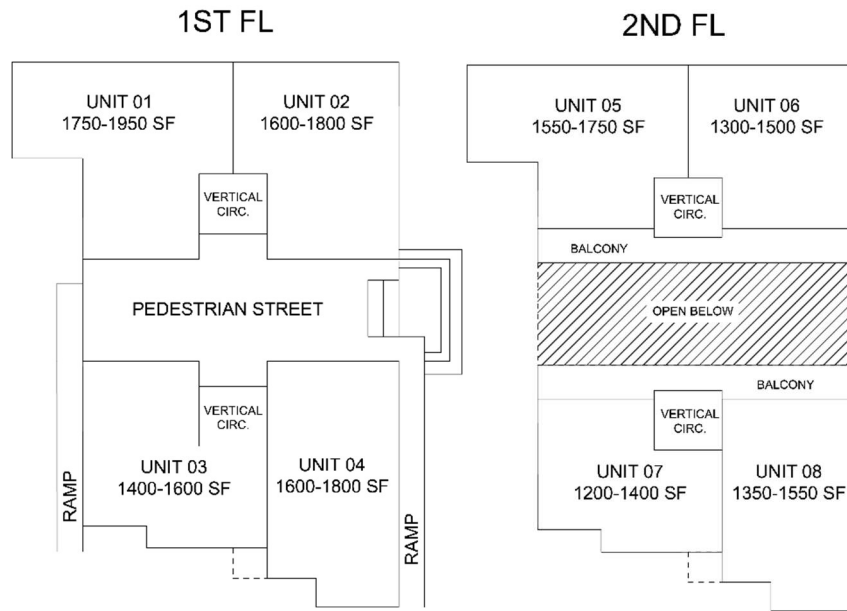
Rough floor space planning (LEFT) estimating potential square footage.
